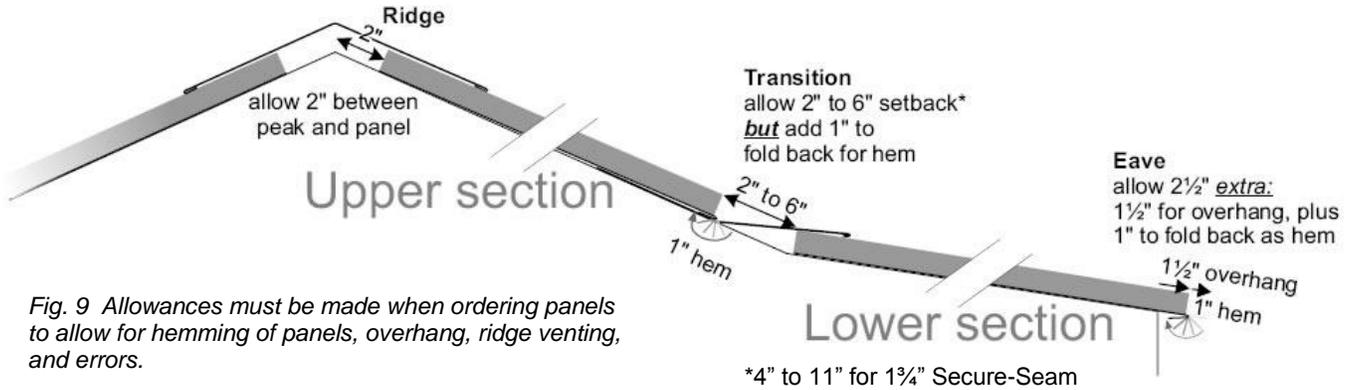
Allowances must be made when ordering panels to allow for hemming of panels, overhang, ridge venting, and errors.
